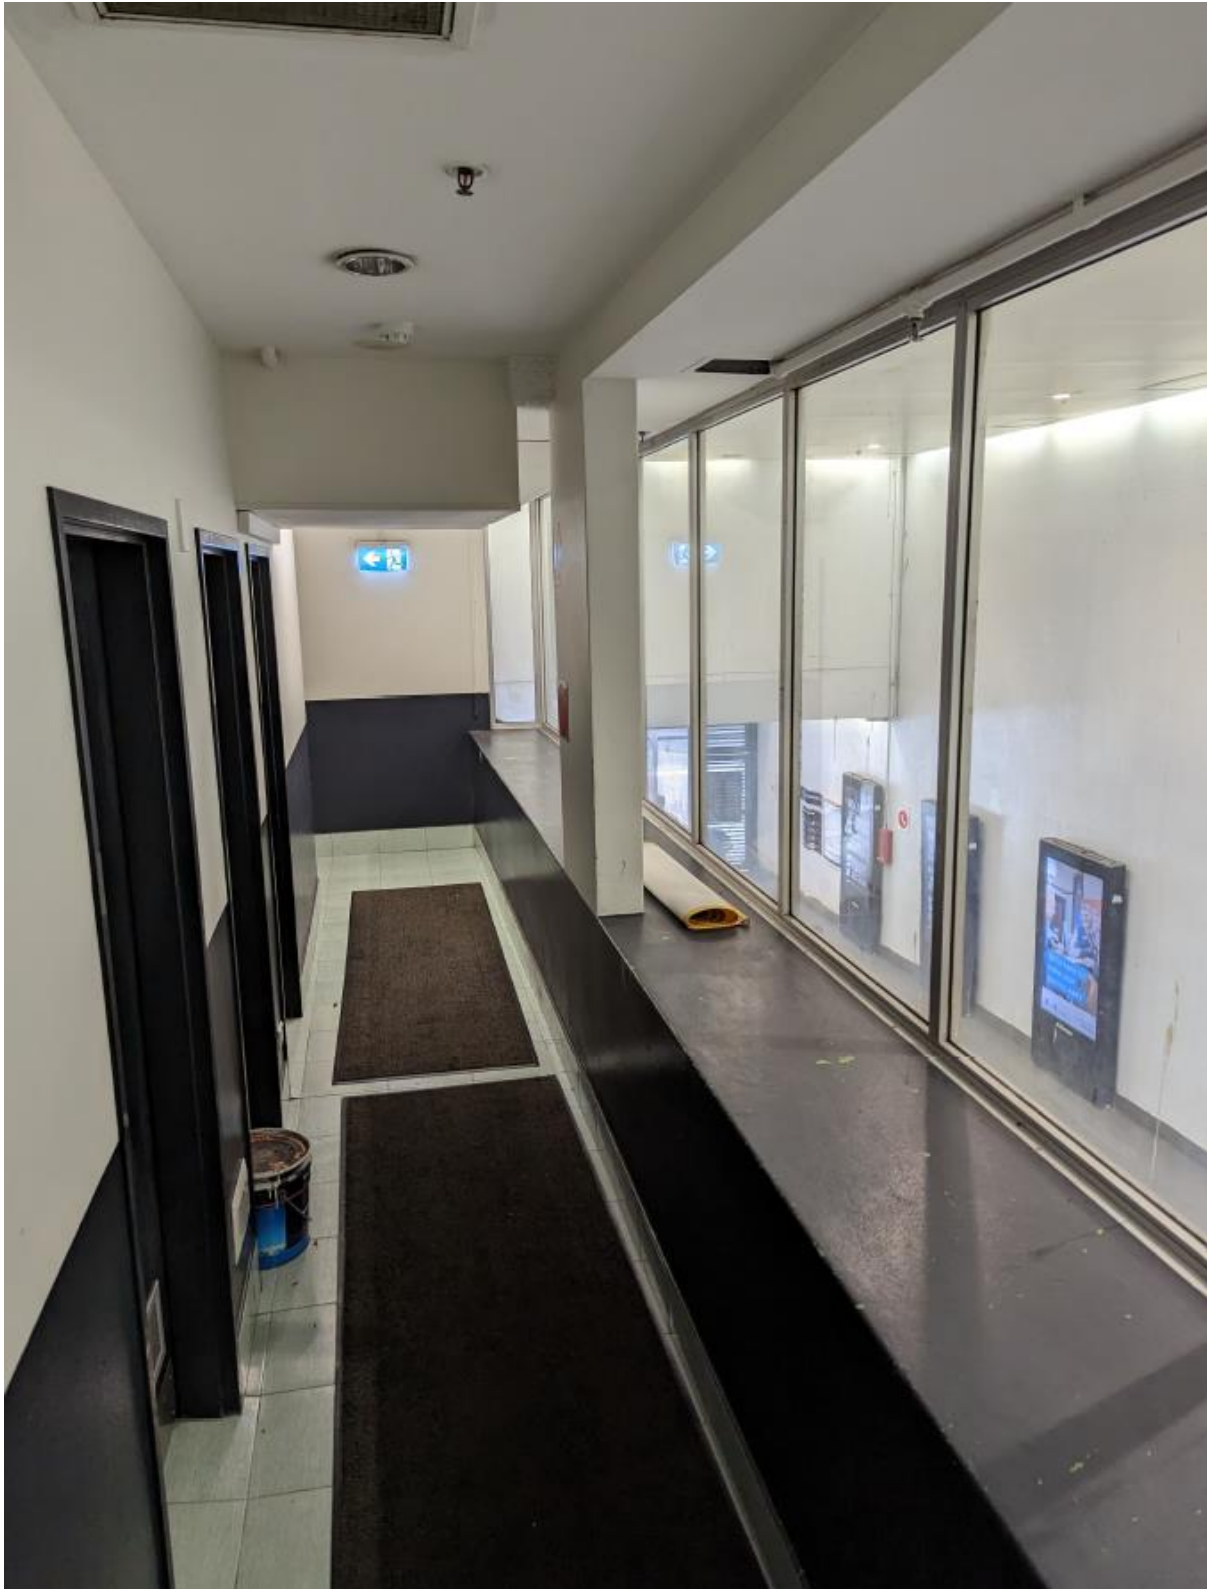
Level 1 walkway of backpacker accommodation overlooking retail arcade entrance to Kings Cross Station
